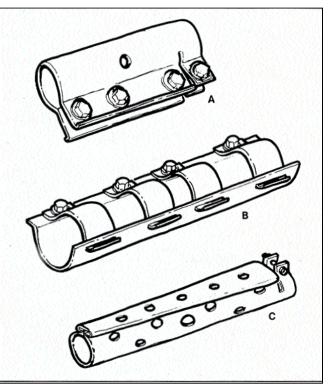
Compression splice sleeves. The two upper splices (A and B) are bolted steel sleeves. One is a cylindrical shell with bolted flanges at one side; the other is a half-cylinder with straps which clip into one side of the cylindrical shell and are bolted to the other edge. The bottom splice (C) tightens by wedge action. The cylindrical sleeve has a tapered opening with flattened collar flanges. A wedgeshaped piece with edges which wrap around the flanges slides into position, then is driven down with a hammer.
